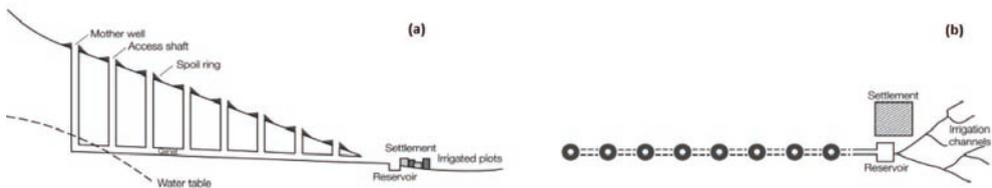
Typical cross section and bird view of a karez system (Source: Kamaz, Z. 2010)
